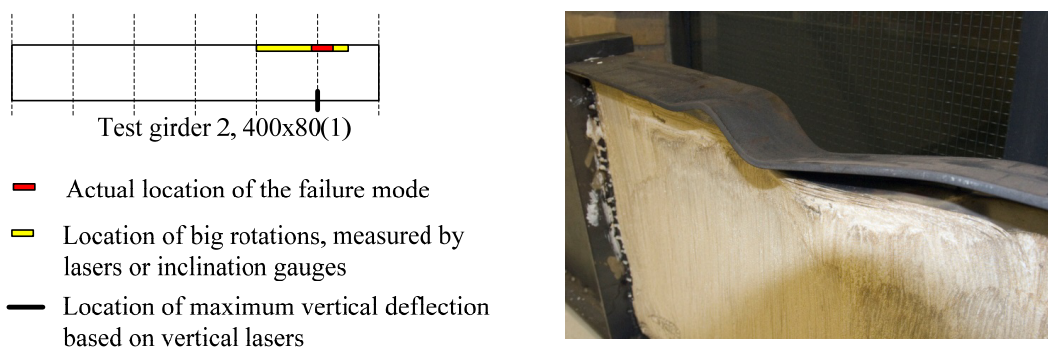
Location of the final failure mode of test girder 2, 400x80(1)
